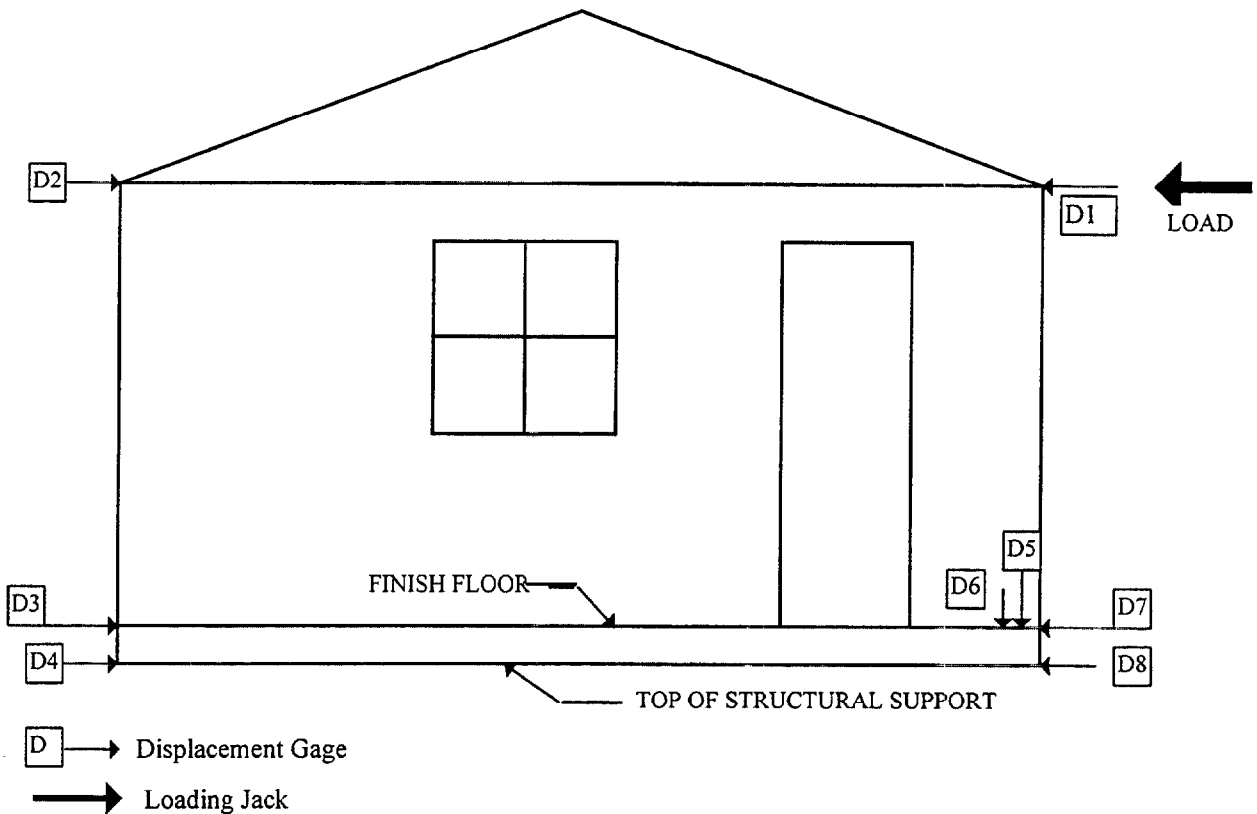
Location of Loading Jacks and Displacement Gages (after Tuomi and McCutcheon, 1974).
